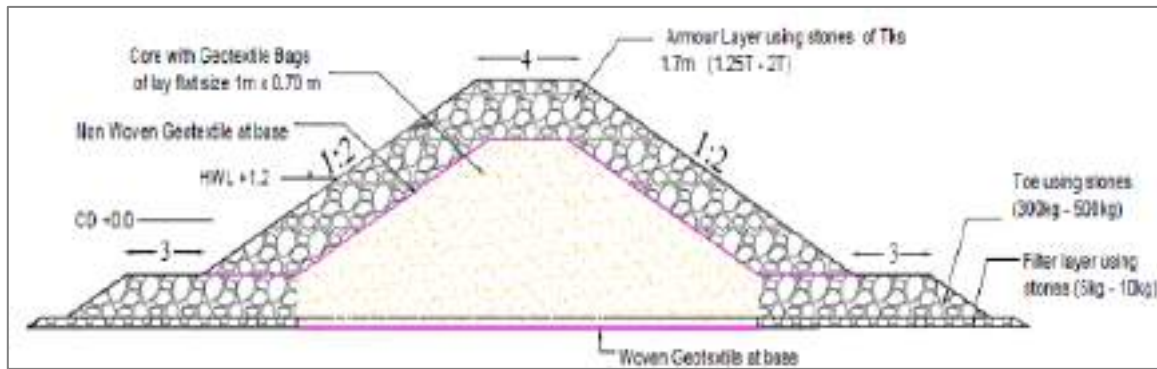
Groynes cross section with inner core layer replaced with geotextile bags and tubes
